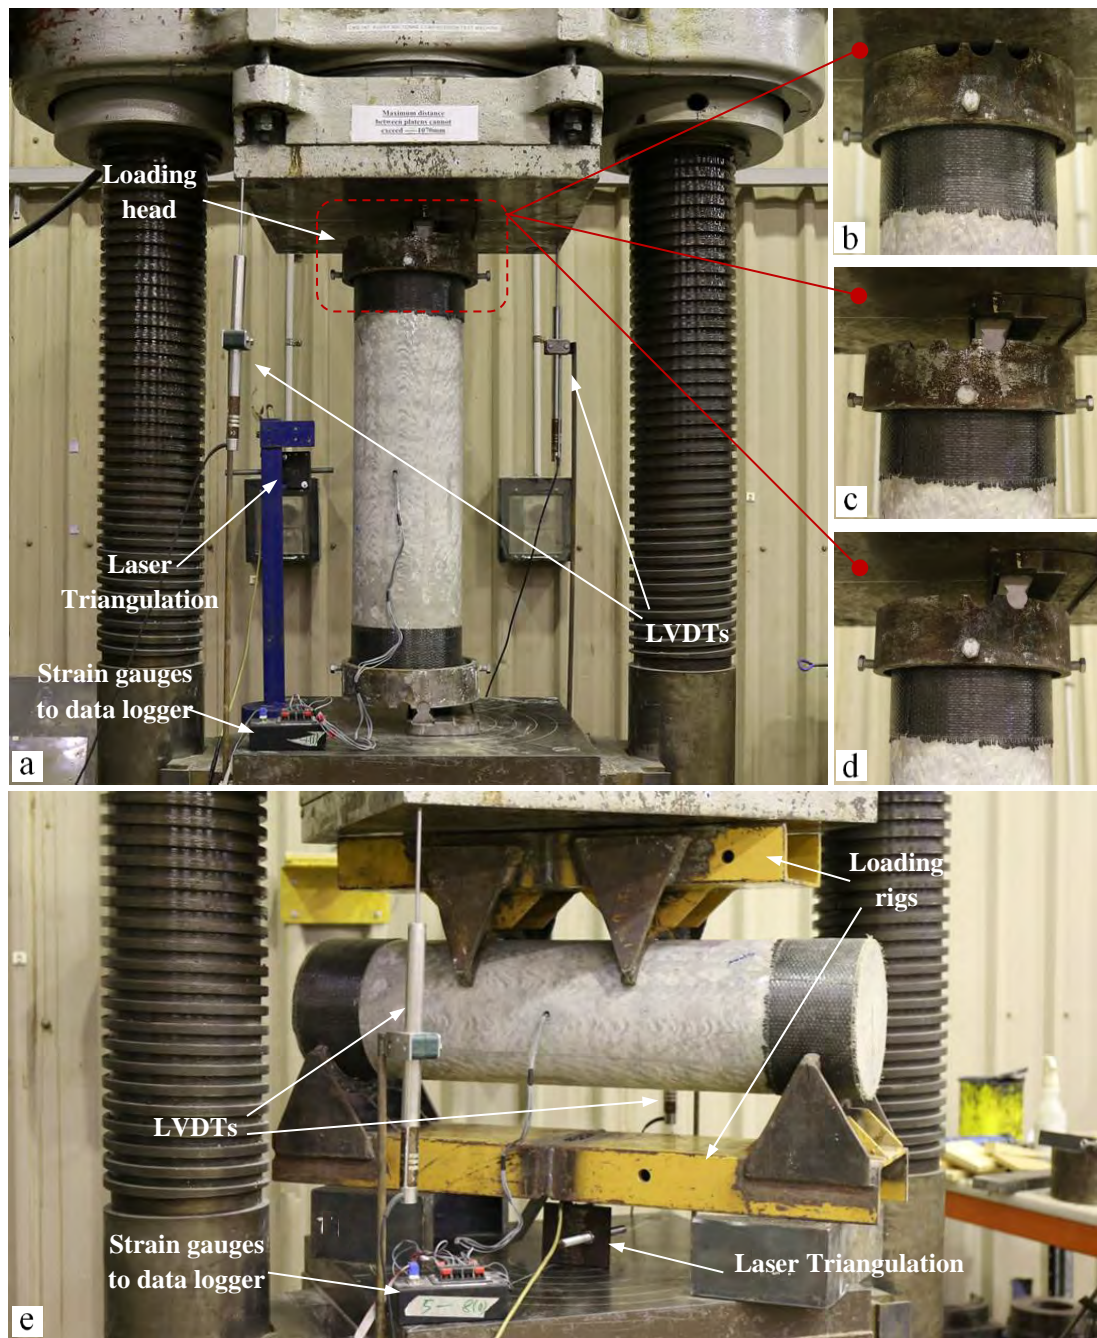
Testing of the specimens: (a) test setup of column specimens; (b) loading head setup for concentrically loaded column specimens; (c) loading head setup for column specimens tested under 25 mm eccentric axial load; (d) loading head setup for column specimens tested under 50 mm eccentric axial load and (e) test setup of the beam specimens.
